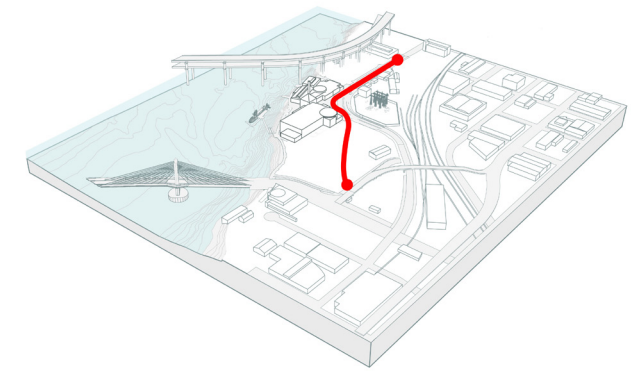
D - Detail plan of Central Spine and surrounding context
